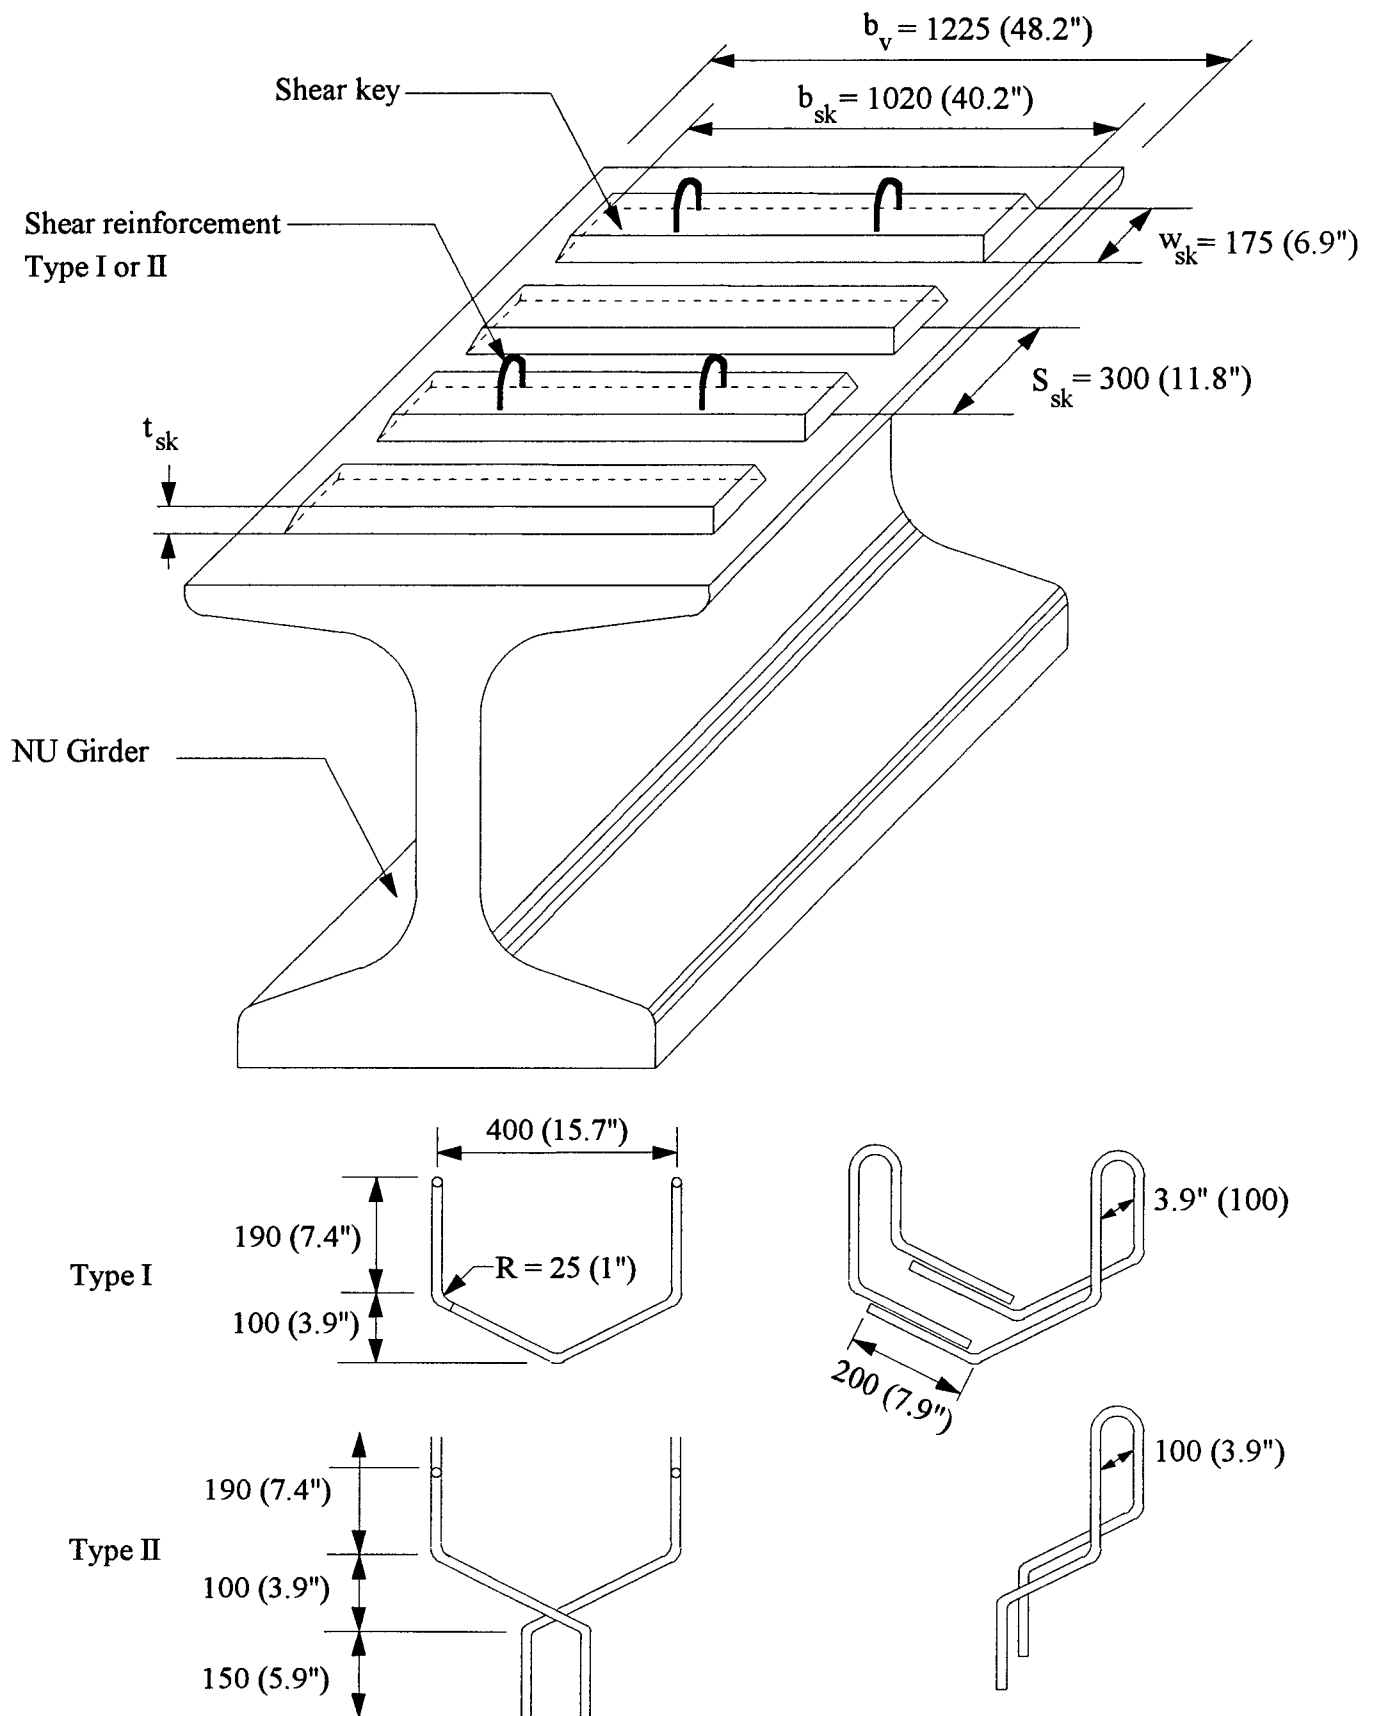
Girder Shear Key as Proposed by Kamel (1996)
